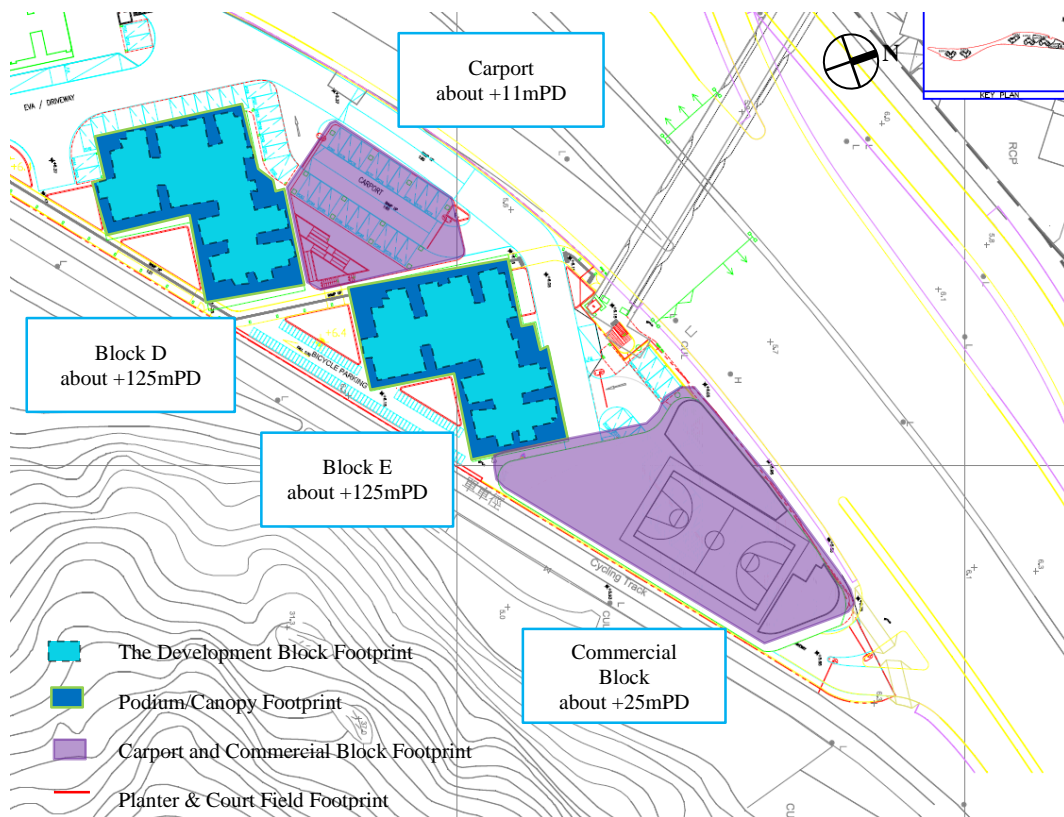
Proposed Scheme Master Layout Plan (Block D & E and Commercial Block)
